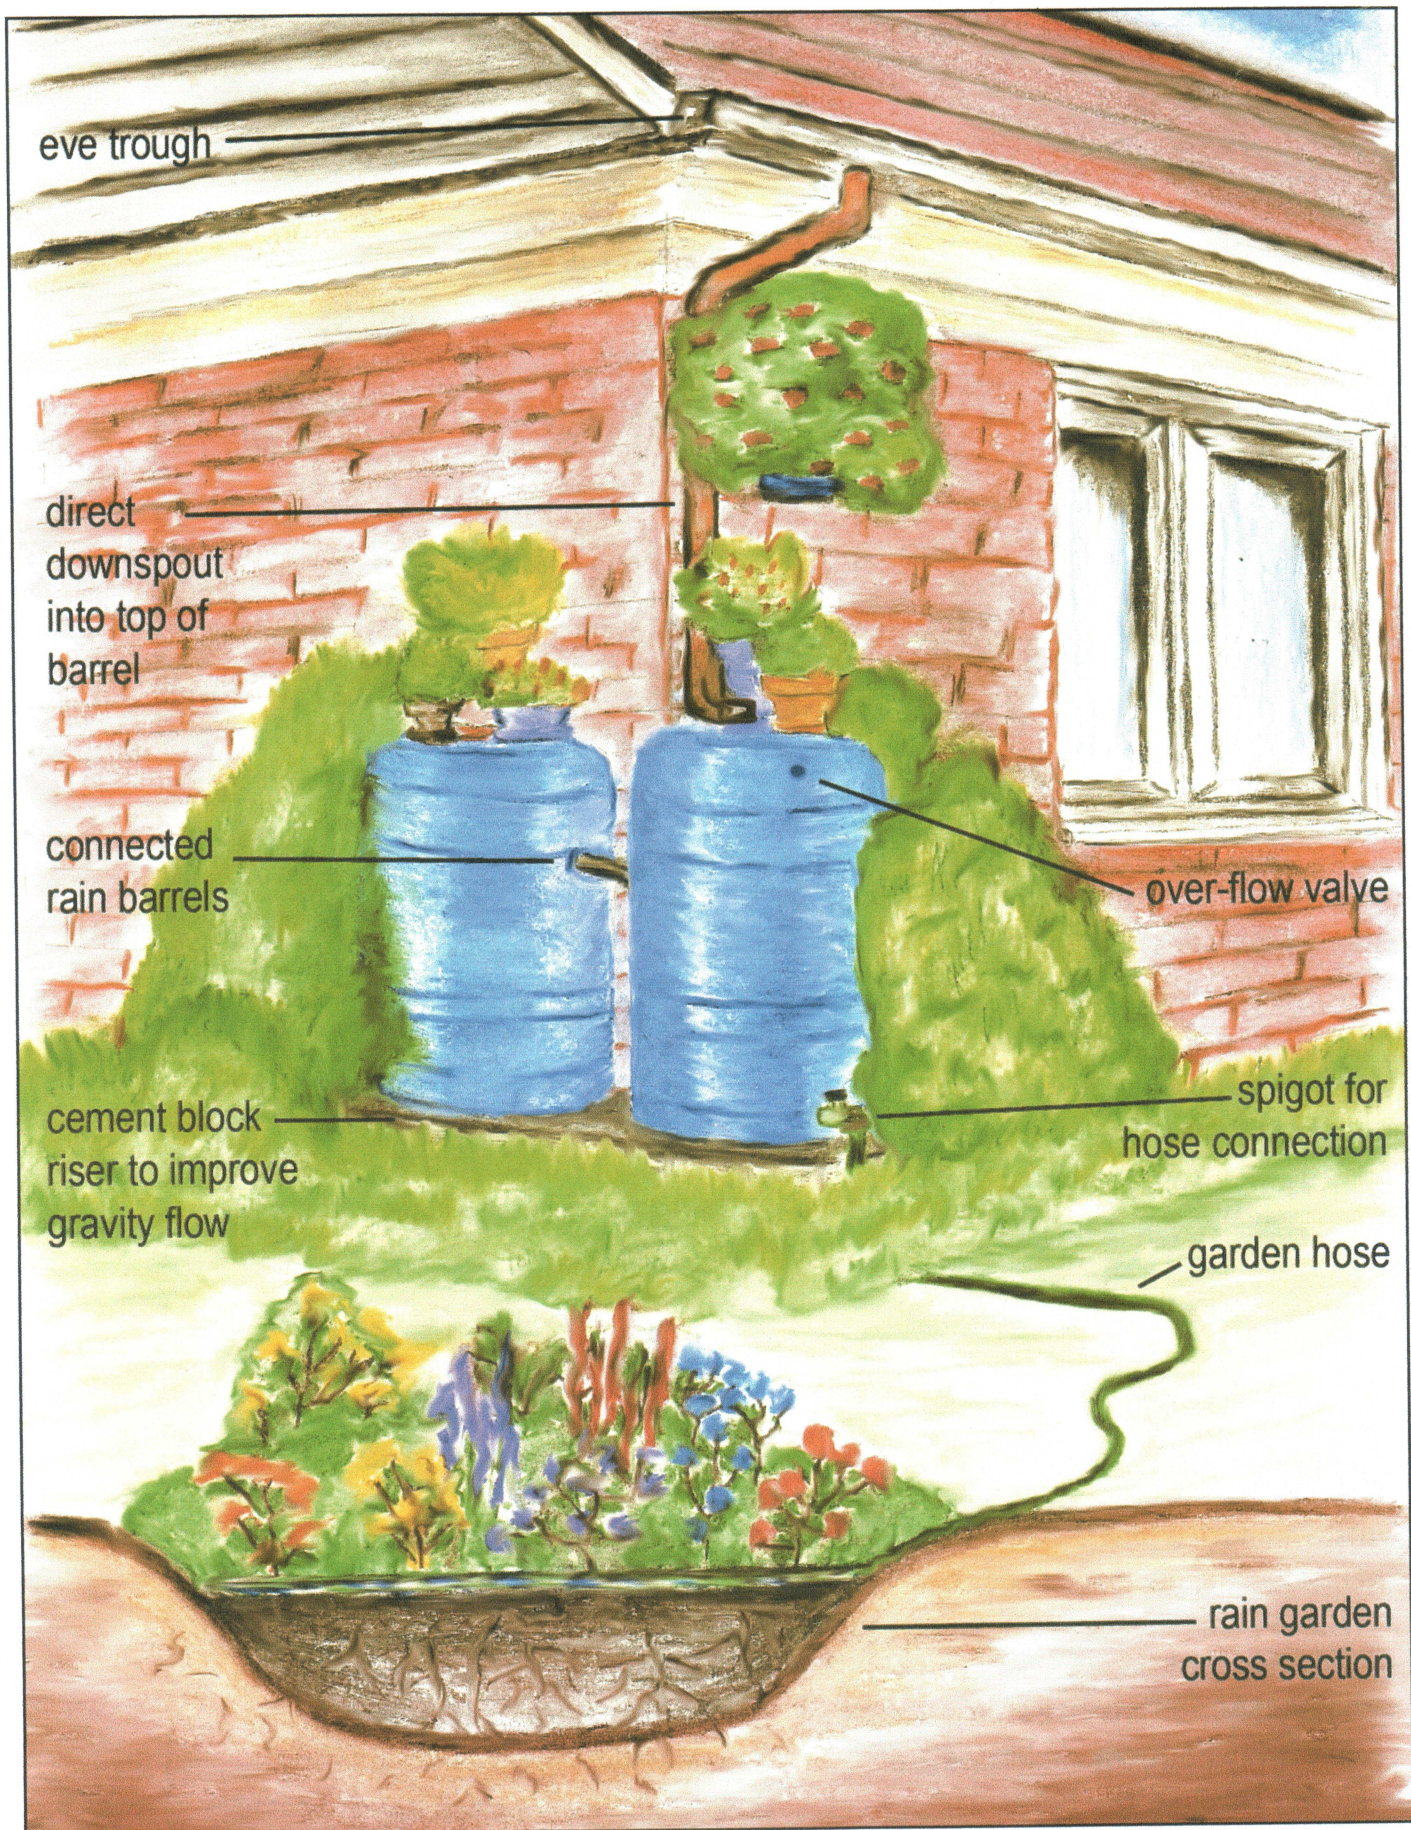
The drawing above illustrates how rain gardens and rain barrels work together to capture runoff. The downspout is directed into a rain barrel to collect roof runoff. In order to collect more roof runoff, two rain barrels are connected to each other. The excess runoff will pour out through the rain barrel's over-flow valve. You can attach an overflow hose to the valve to help direct flow towards your rain garden. By storing the stormwater runoff in rain barrels, you'll be able to water your rain garden
